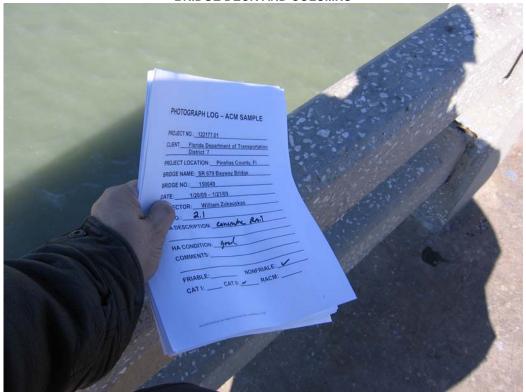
01/21/09 – SAMPLE 2.1 – HA 2 CONCRETE RAILS AND BEAMS
